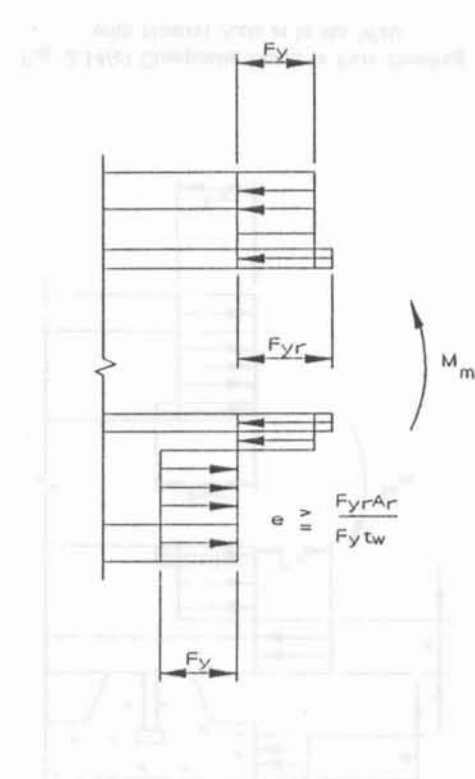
(c) Reinforced Steel Beam in Pure Bending with Neutral Axis in Web
